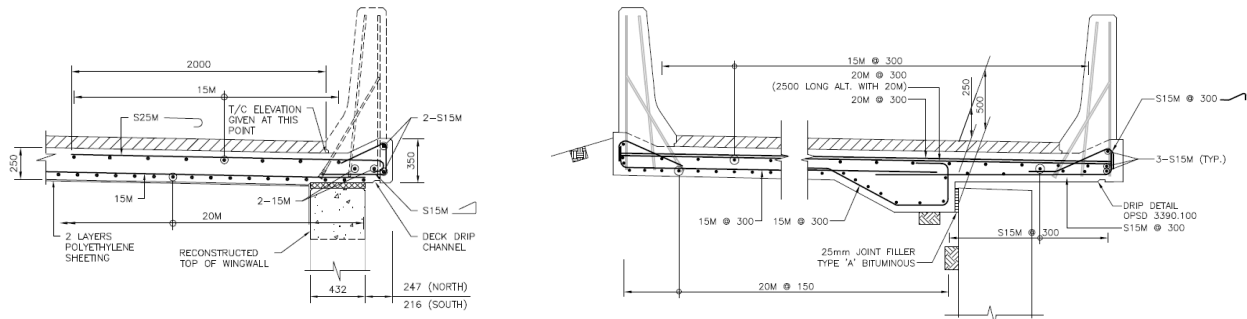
Semi-integral abutment details with barriers continuous from the deck onto the approach slab with approach slabs sliding over the wingwalls, and expansion joint provided at the end of the approach slab
